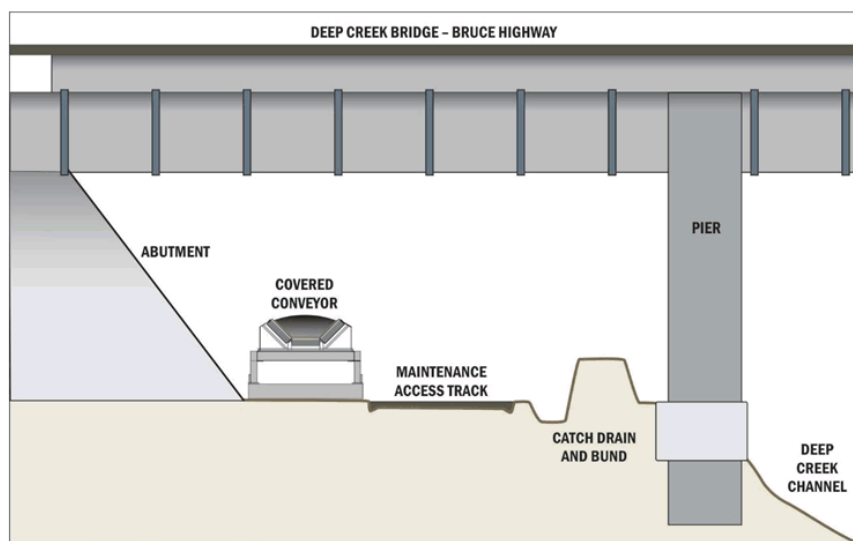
Conveyor crossing under Deep Creek road bridge
